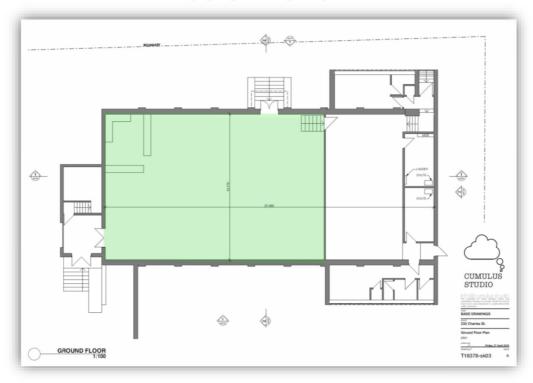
Potters House floor plan (F45 Training area shaded in green).
